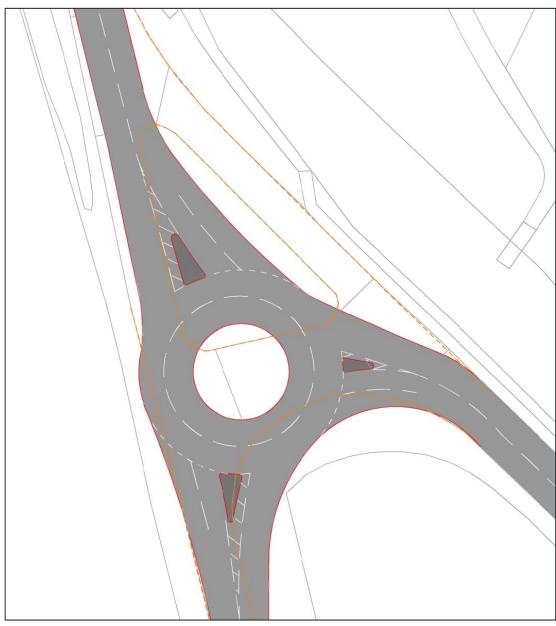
A596 / Branthwaite Road Proposed Improvement Design
